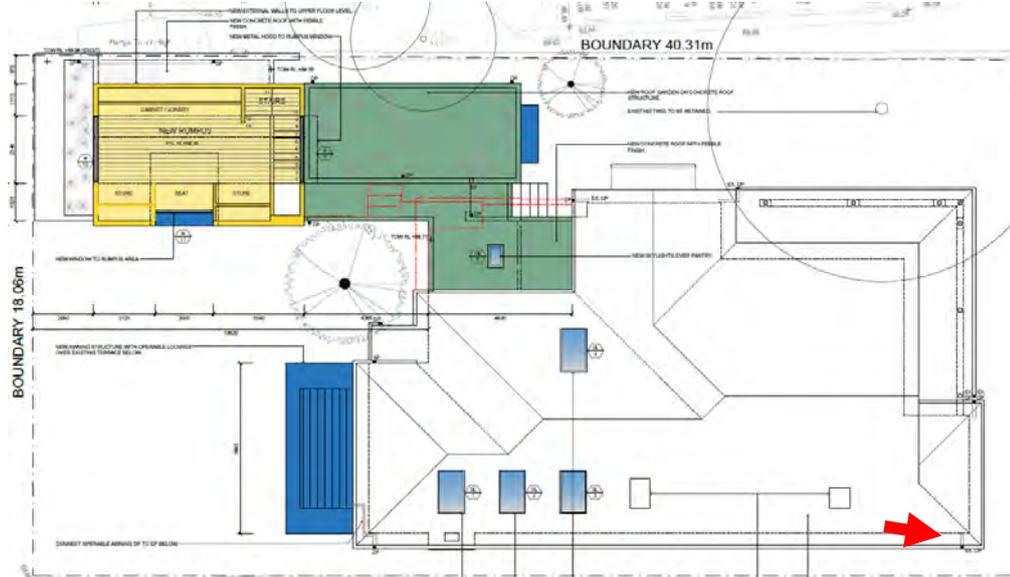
Proposed upper floor plan. (Source: Castlepeake Architecture)
